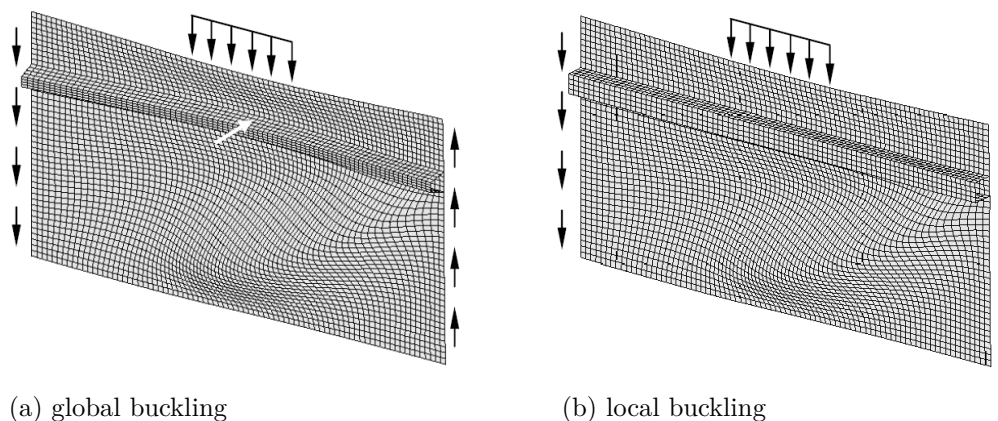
Failure types of girder webs with longitudinal stiffener
